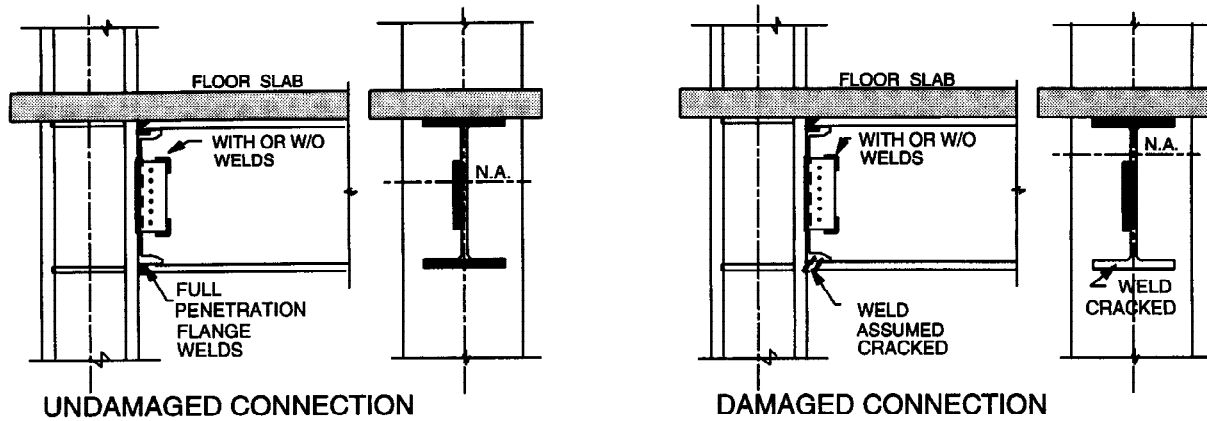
Undamaged and damaged connections of welded steel moment frames.
